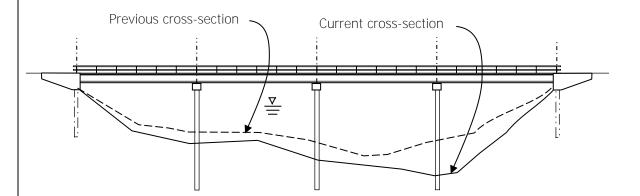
Elevation view showing current cross-section and previous cross-section for a bridge over water.
